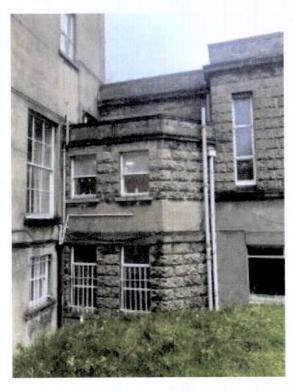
View of NW elevation of Finlay wing and awkward connection to Milltown House. Note stained window panes dating from post 1949 reconstruction
